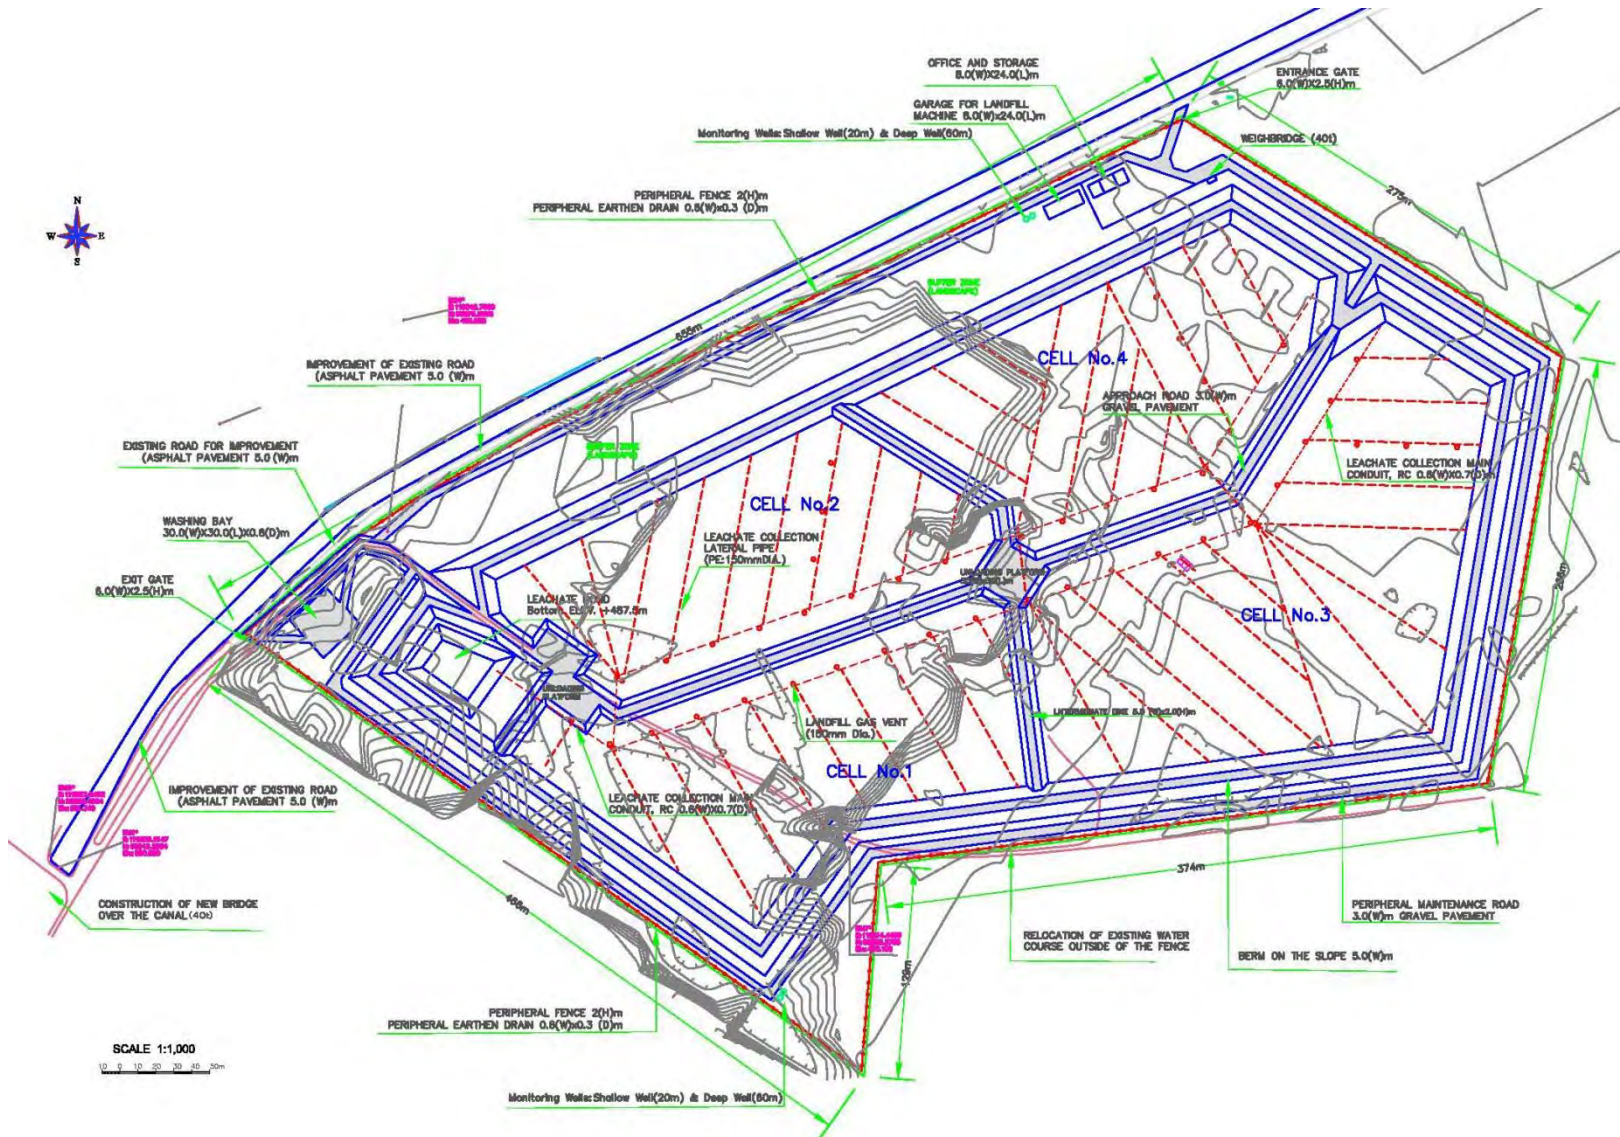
Layout Plan of Bhakhraywali SLF Facilities
